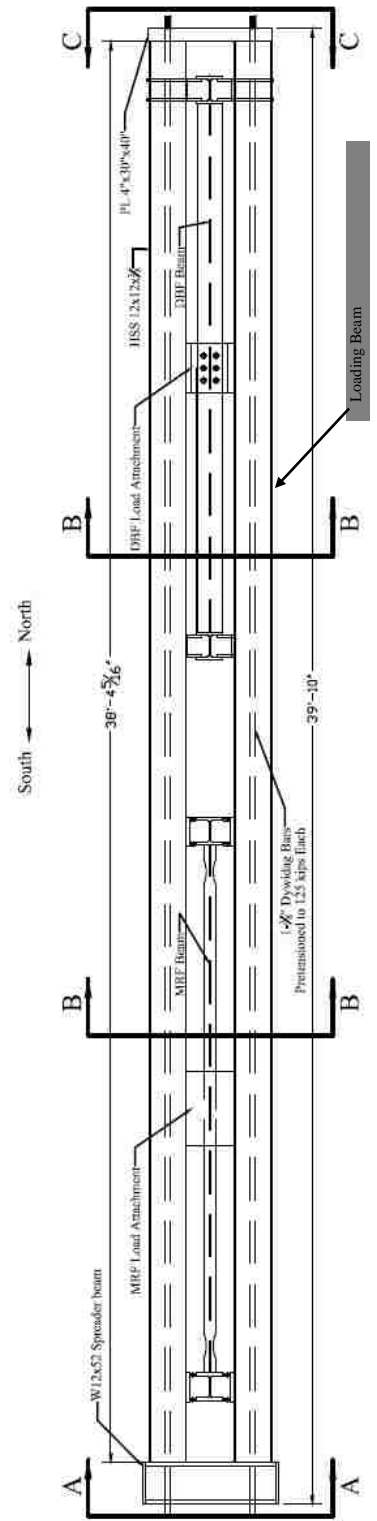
Top View of Loading Beam Configuration for MRF Testing
